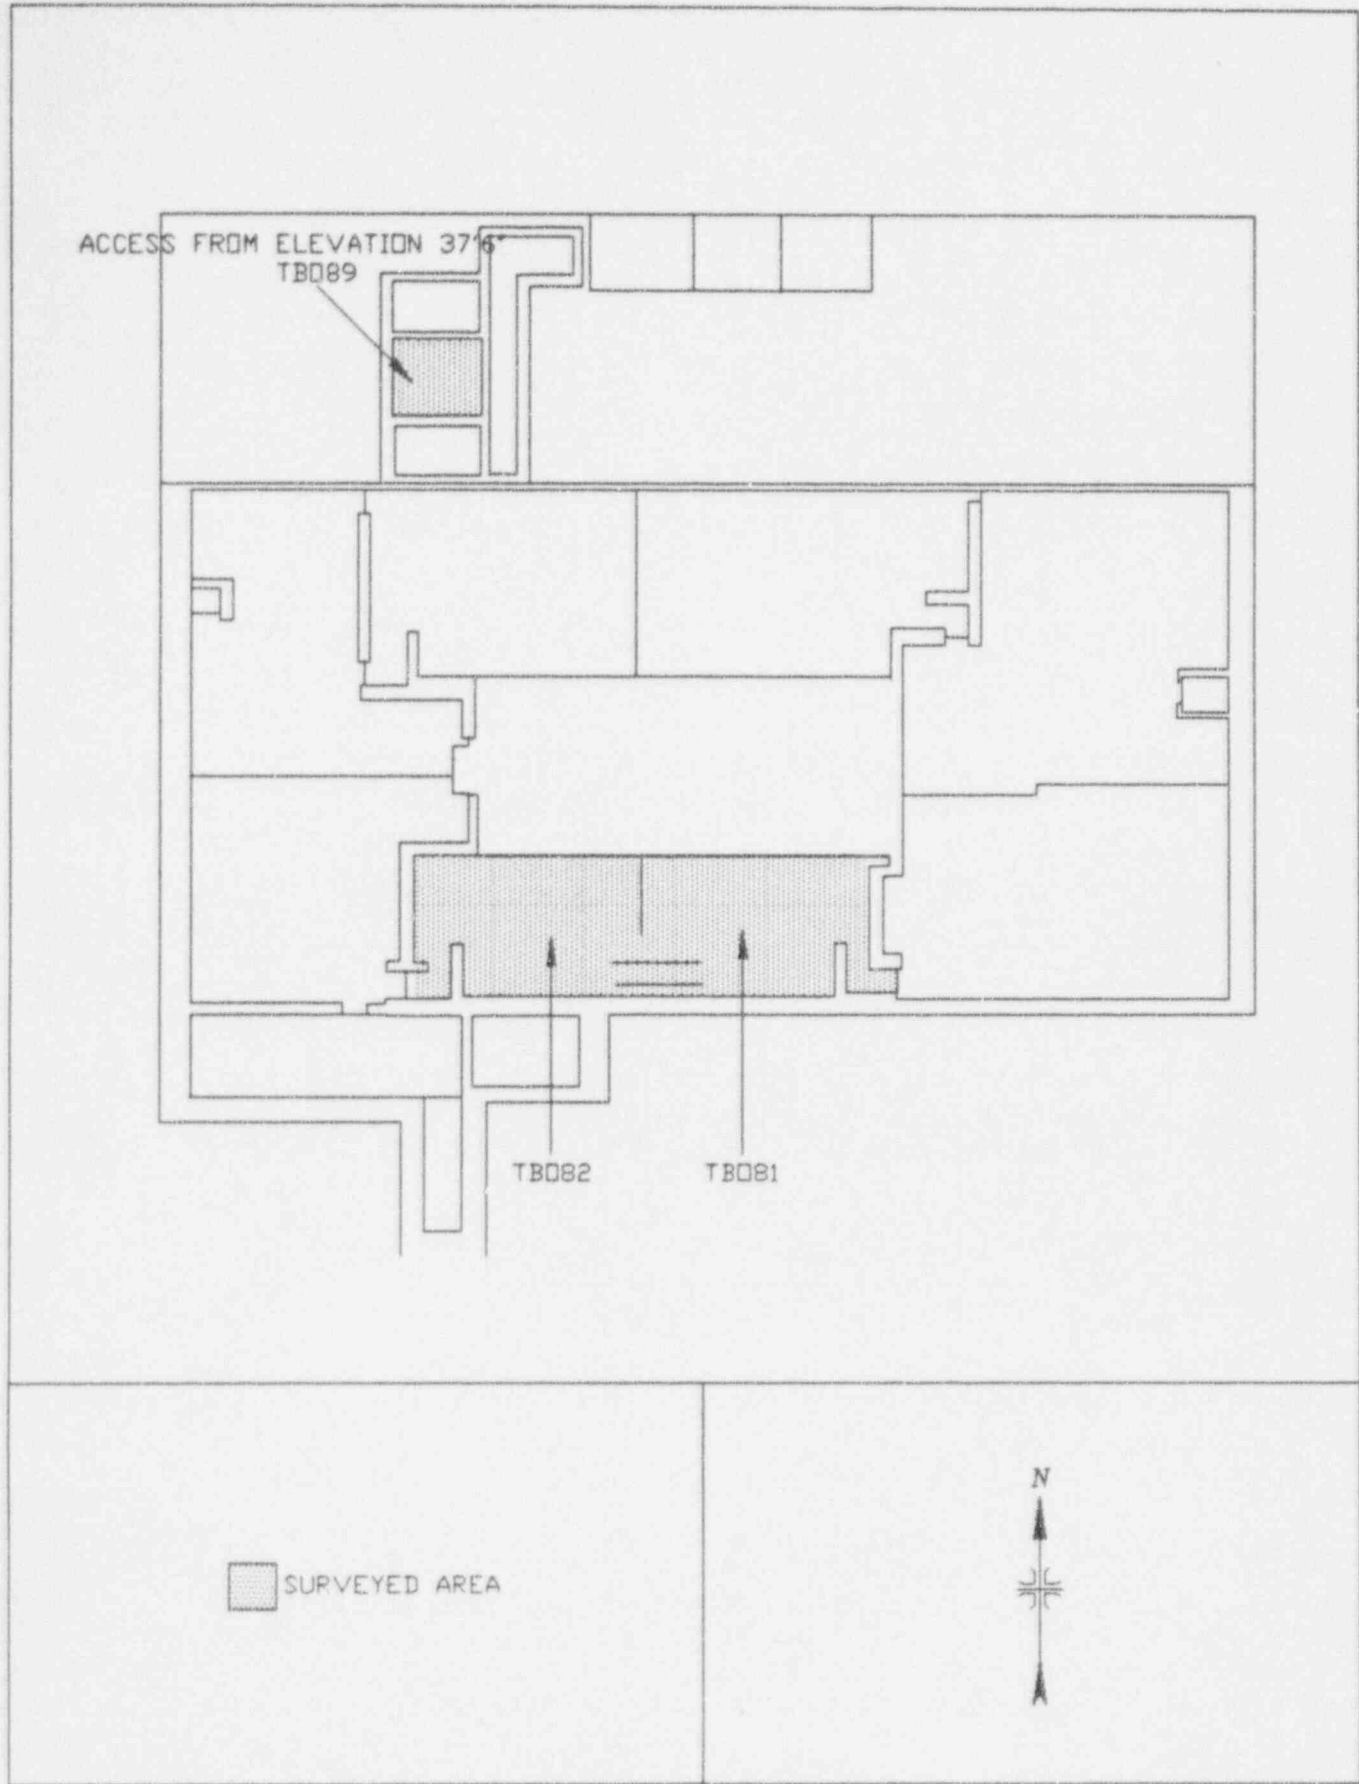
Turbine Building, Elevation 63' - Floor Plan and Areas Surveyed
